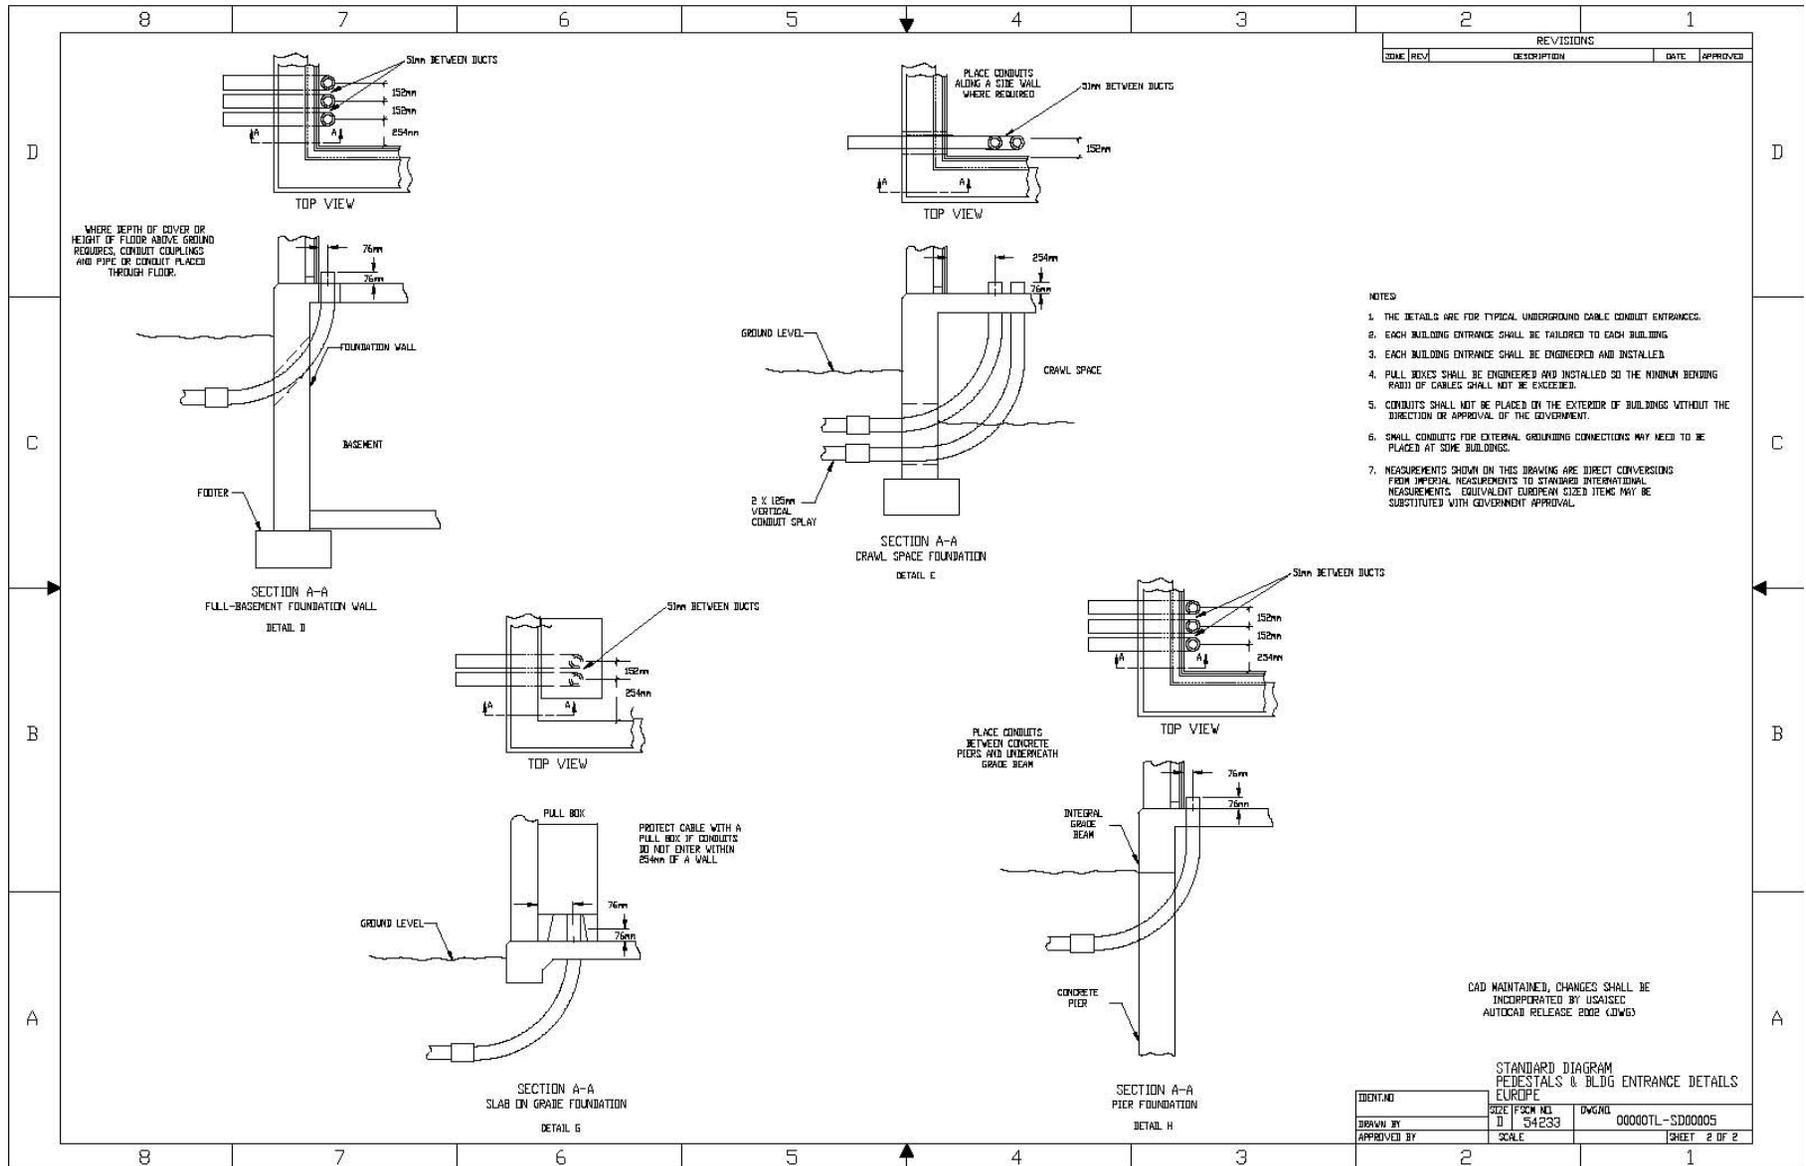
Pedestals and Building Entrance Details – Europe (continued)
